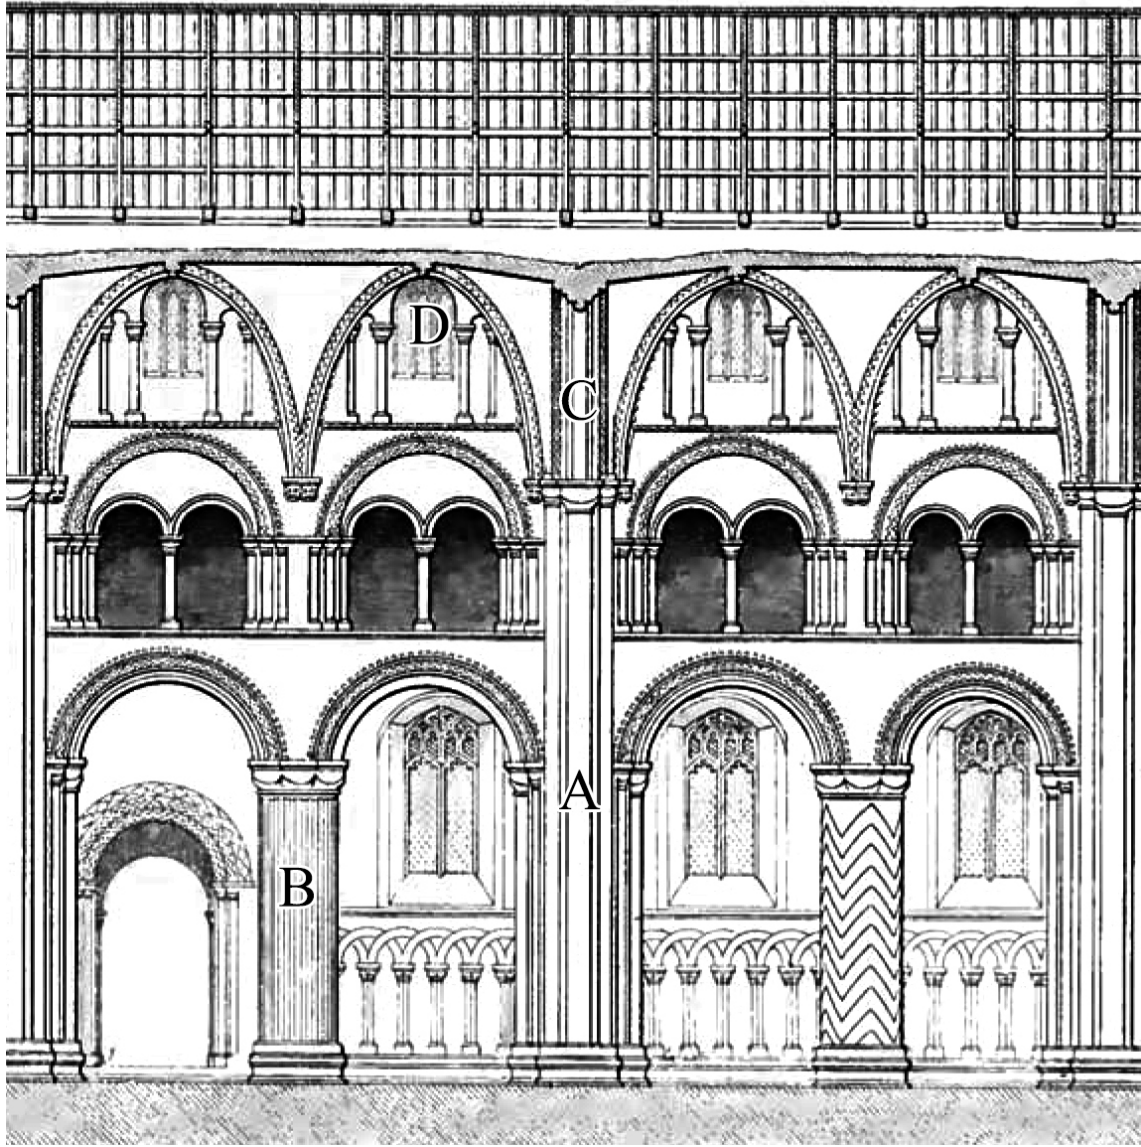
Nave elevation (from Billings 1843). A=large compound piers; B=cylindrical column; C=transverse arch; D=clerestory windows
